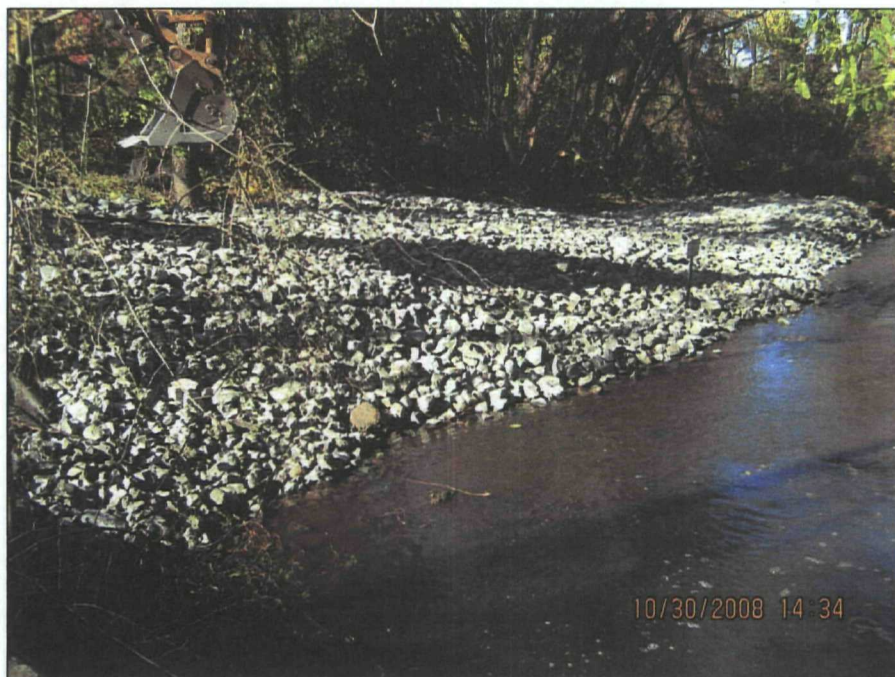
West bank downstream of the twin culvert. A rock box was used for staging rip-rap (October 29, 2008).
